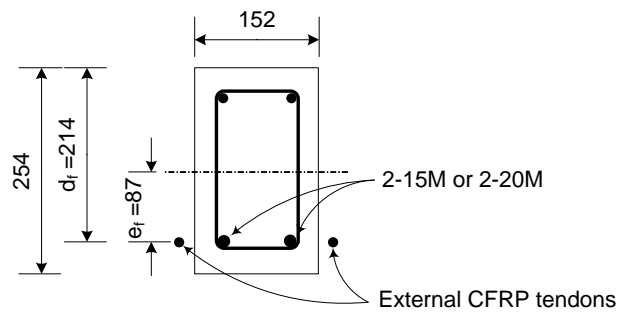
Cross section of the post-tensioned beams in the constant moment zone
